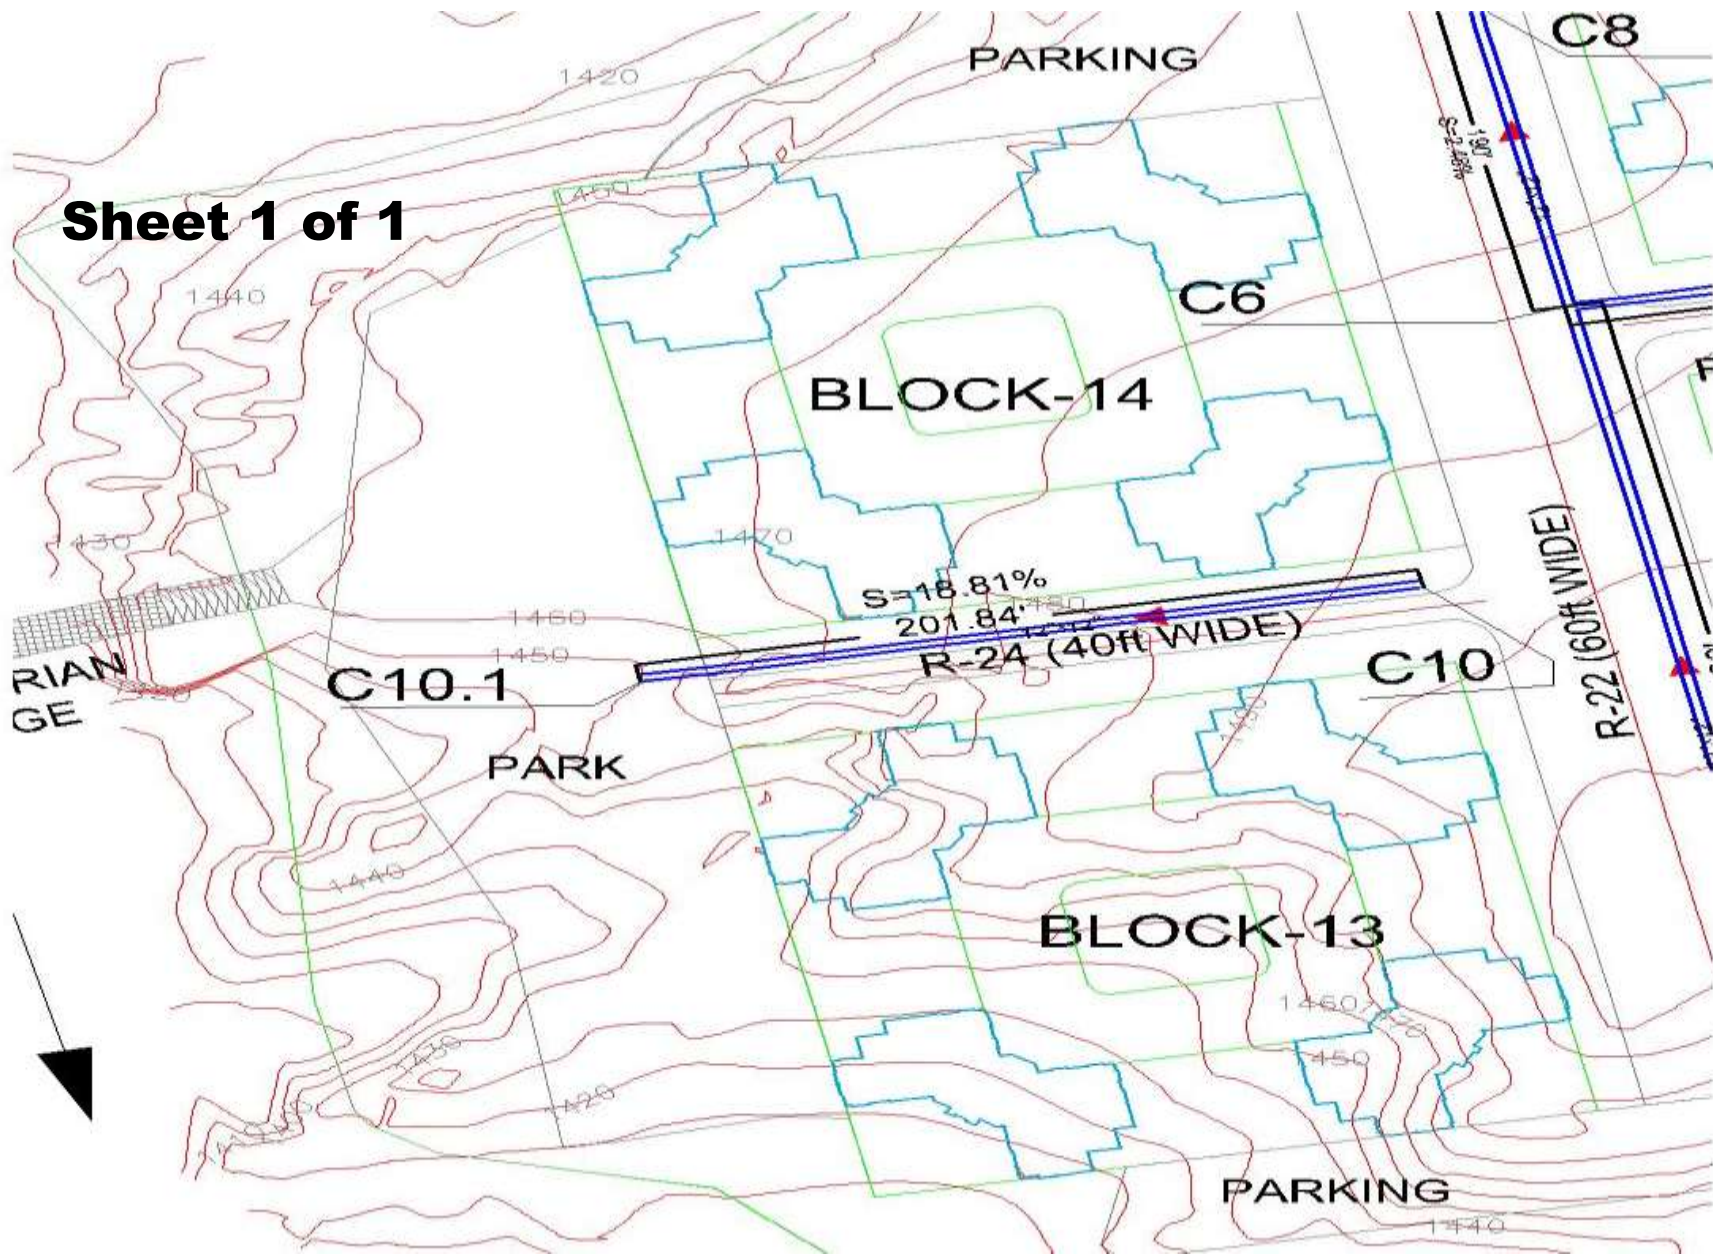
Storm drainage layout plan of Sub-catchment-12 showing final disposal nodes C10.1
